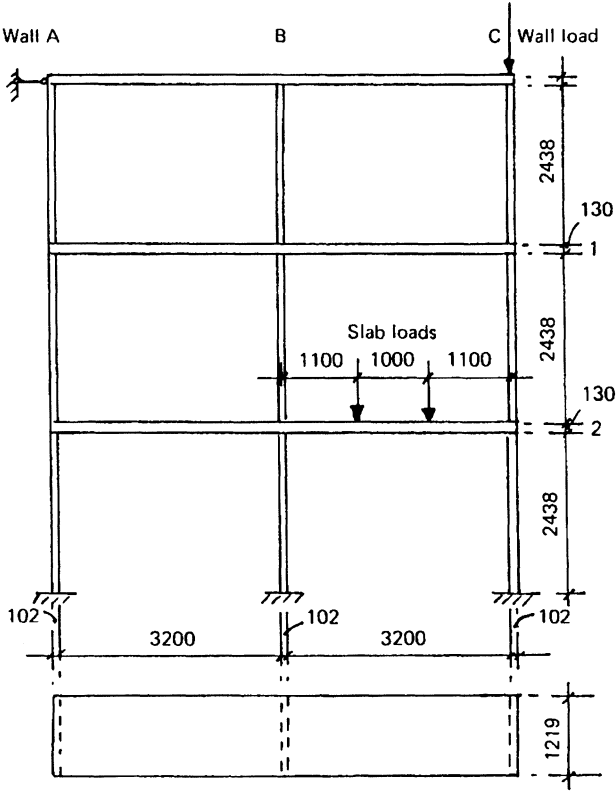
Test structure for wall–floor slab interaction: full scale with 103 mm thick walls
